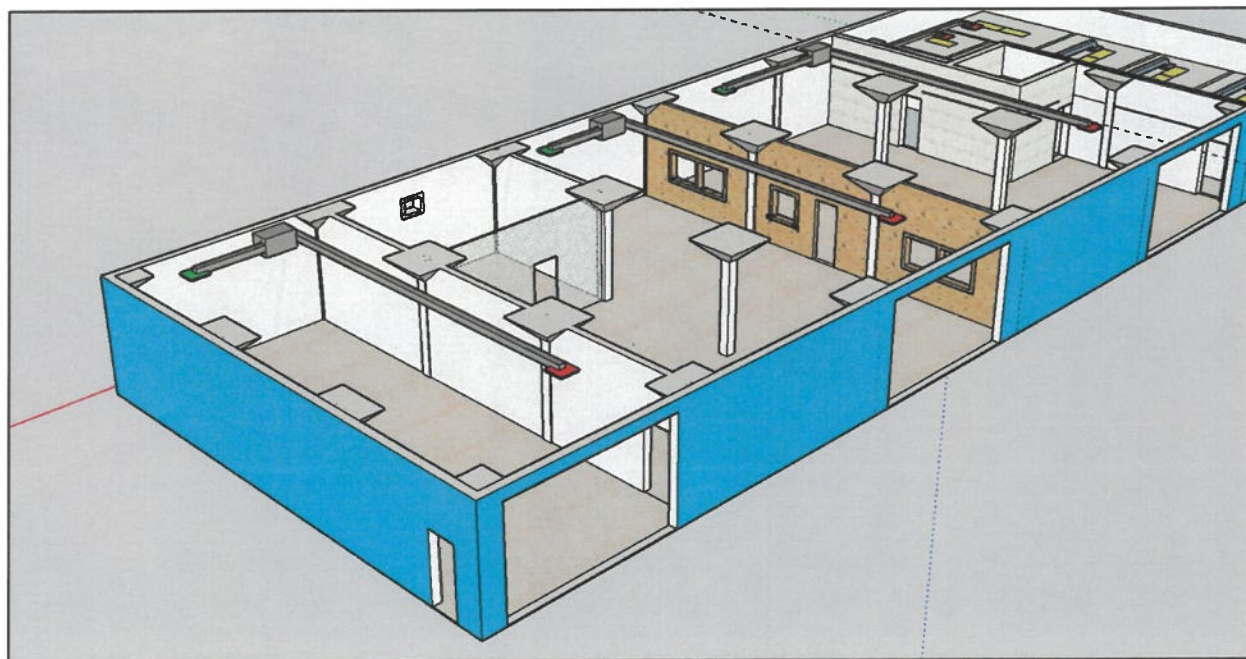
Recommended layout for HRV ducts above Garage Bays of Building 502 (Isometric View).
